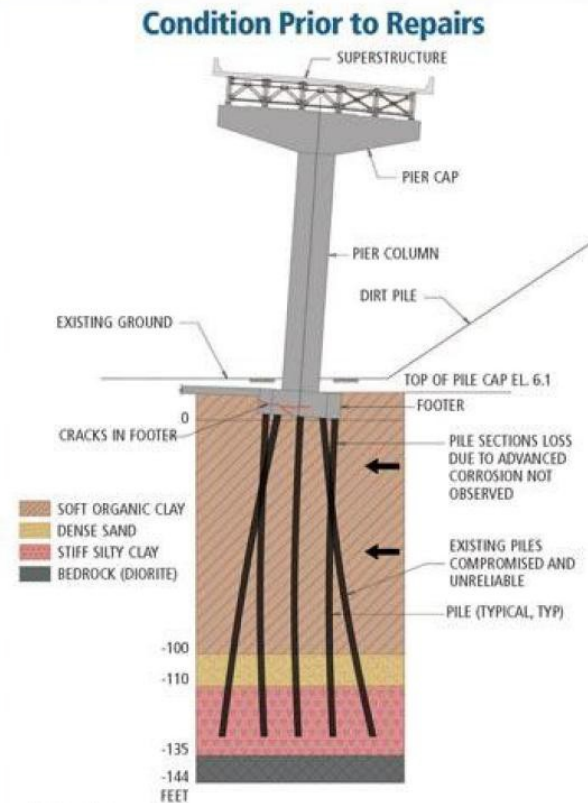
Subsurface Profile and Observed Damage at I-495 Bridge (O’Shea, 2015)
